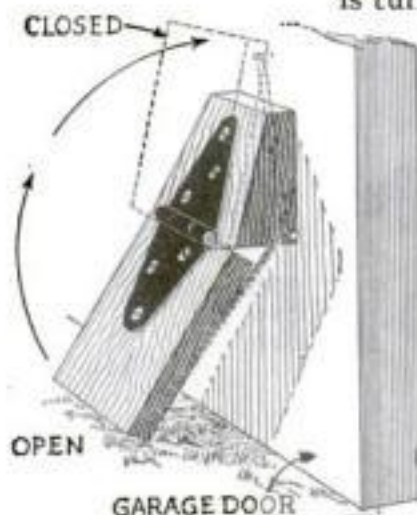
A simple door check made with hinged blocks of wood and a small spring.
